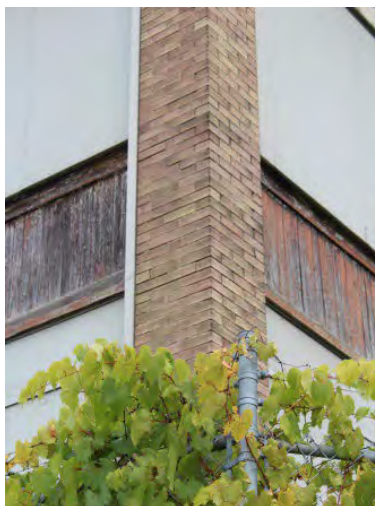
West Wing – West Porches – West Elevation (Photo No. 104.7)
